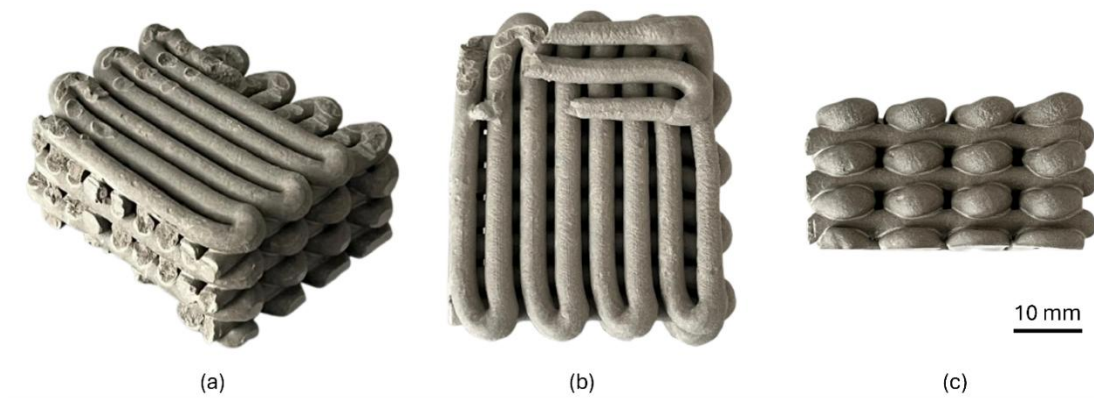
3D printed specimens: whole specimen (a); top view (b); side view (c).
